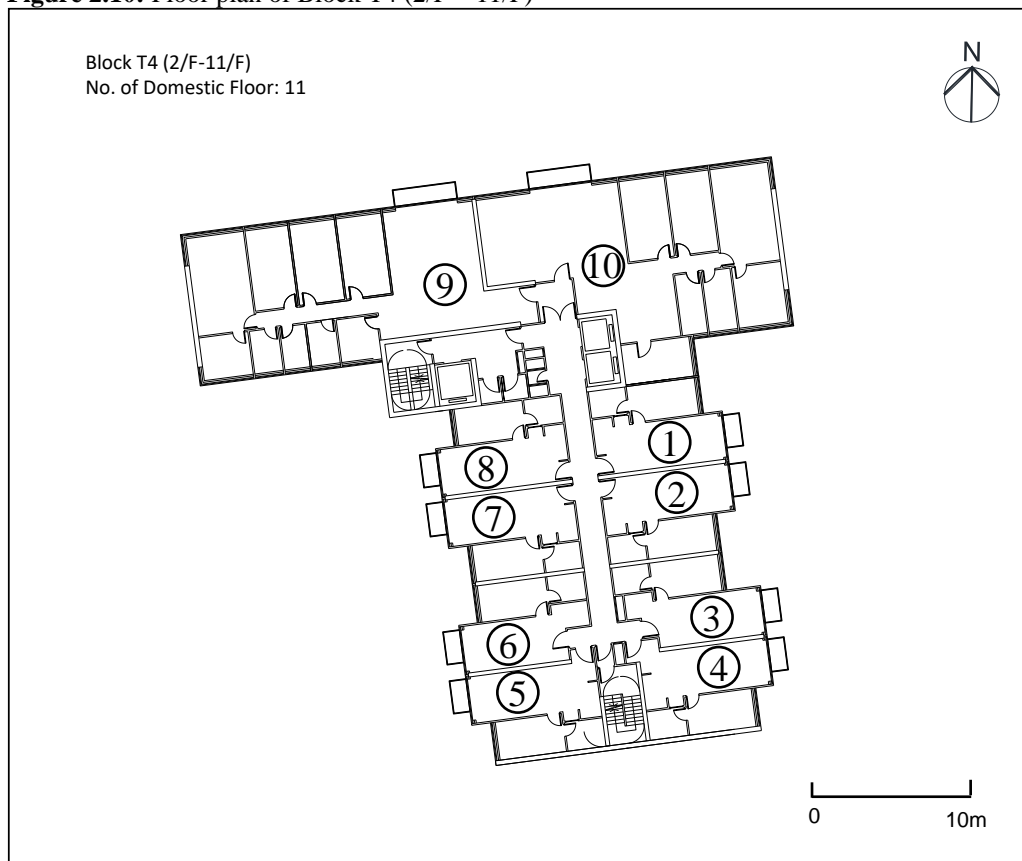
Floor plan of Block T4 (2/F – 11/F)
